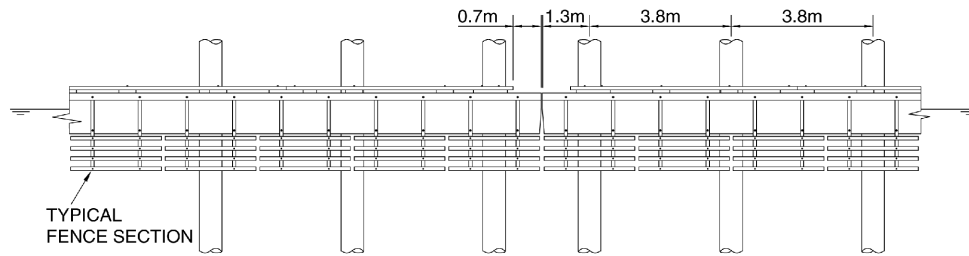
Elevation Showing the Floating Breakwater and Pile Restraints.
